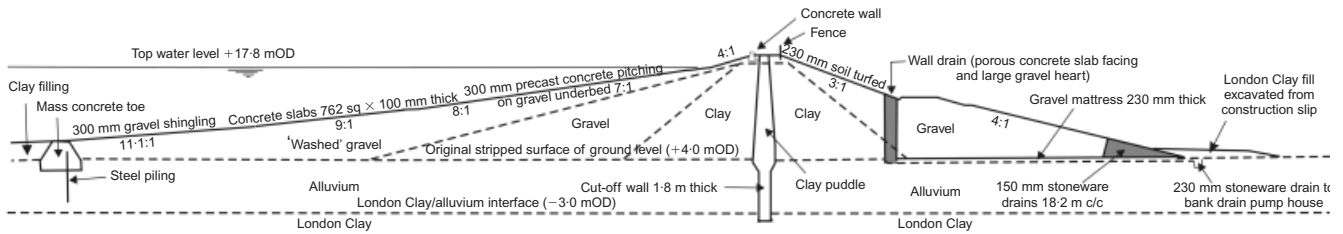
Typical cross-section of main dam (after French *et al.*, 2000)
